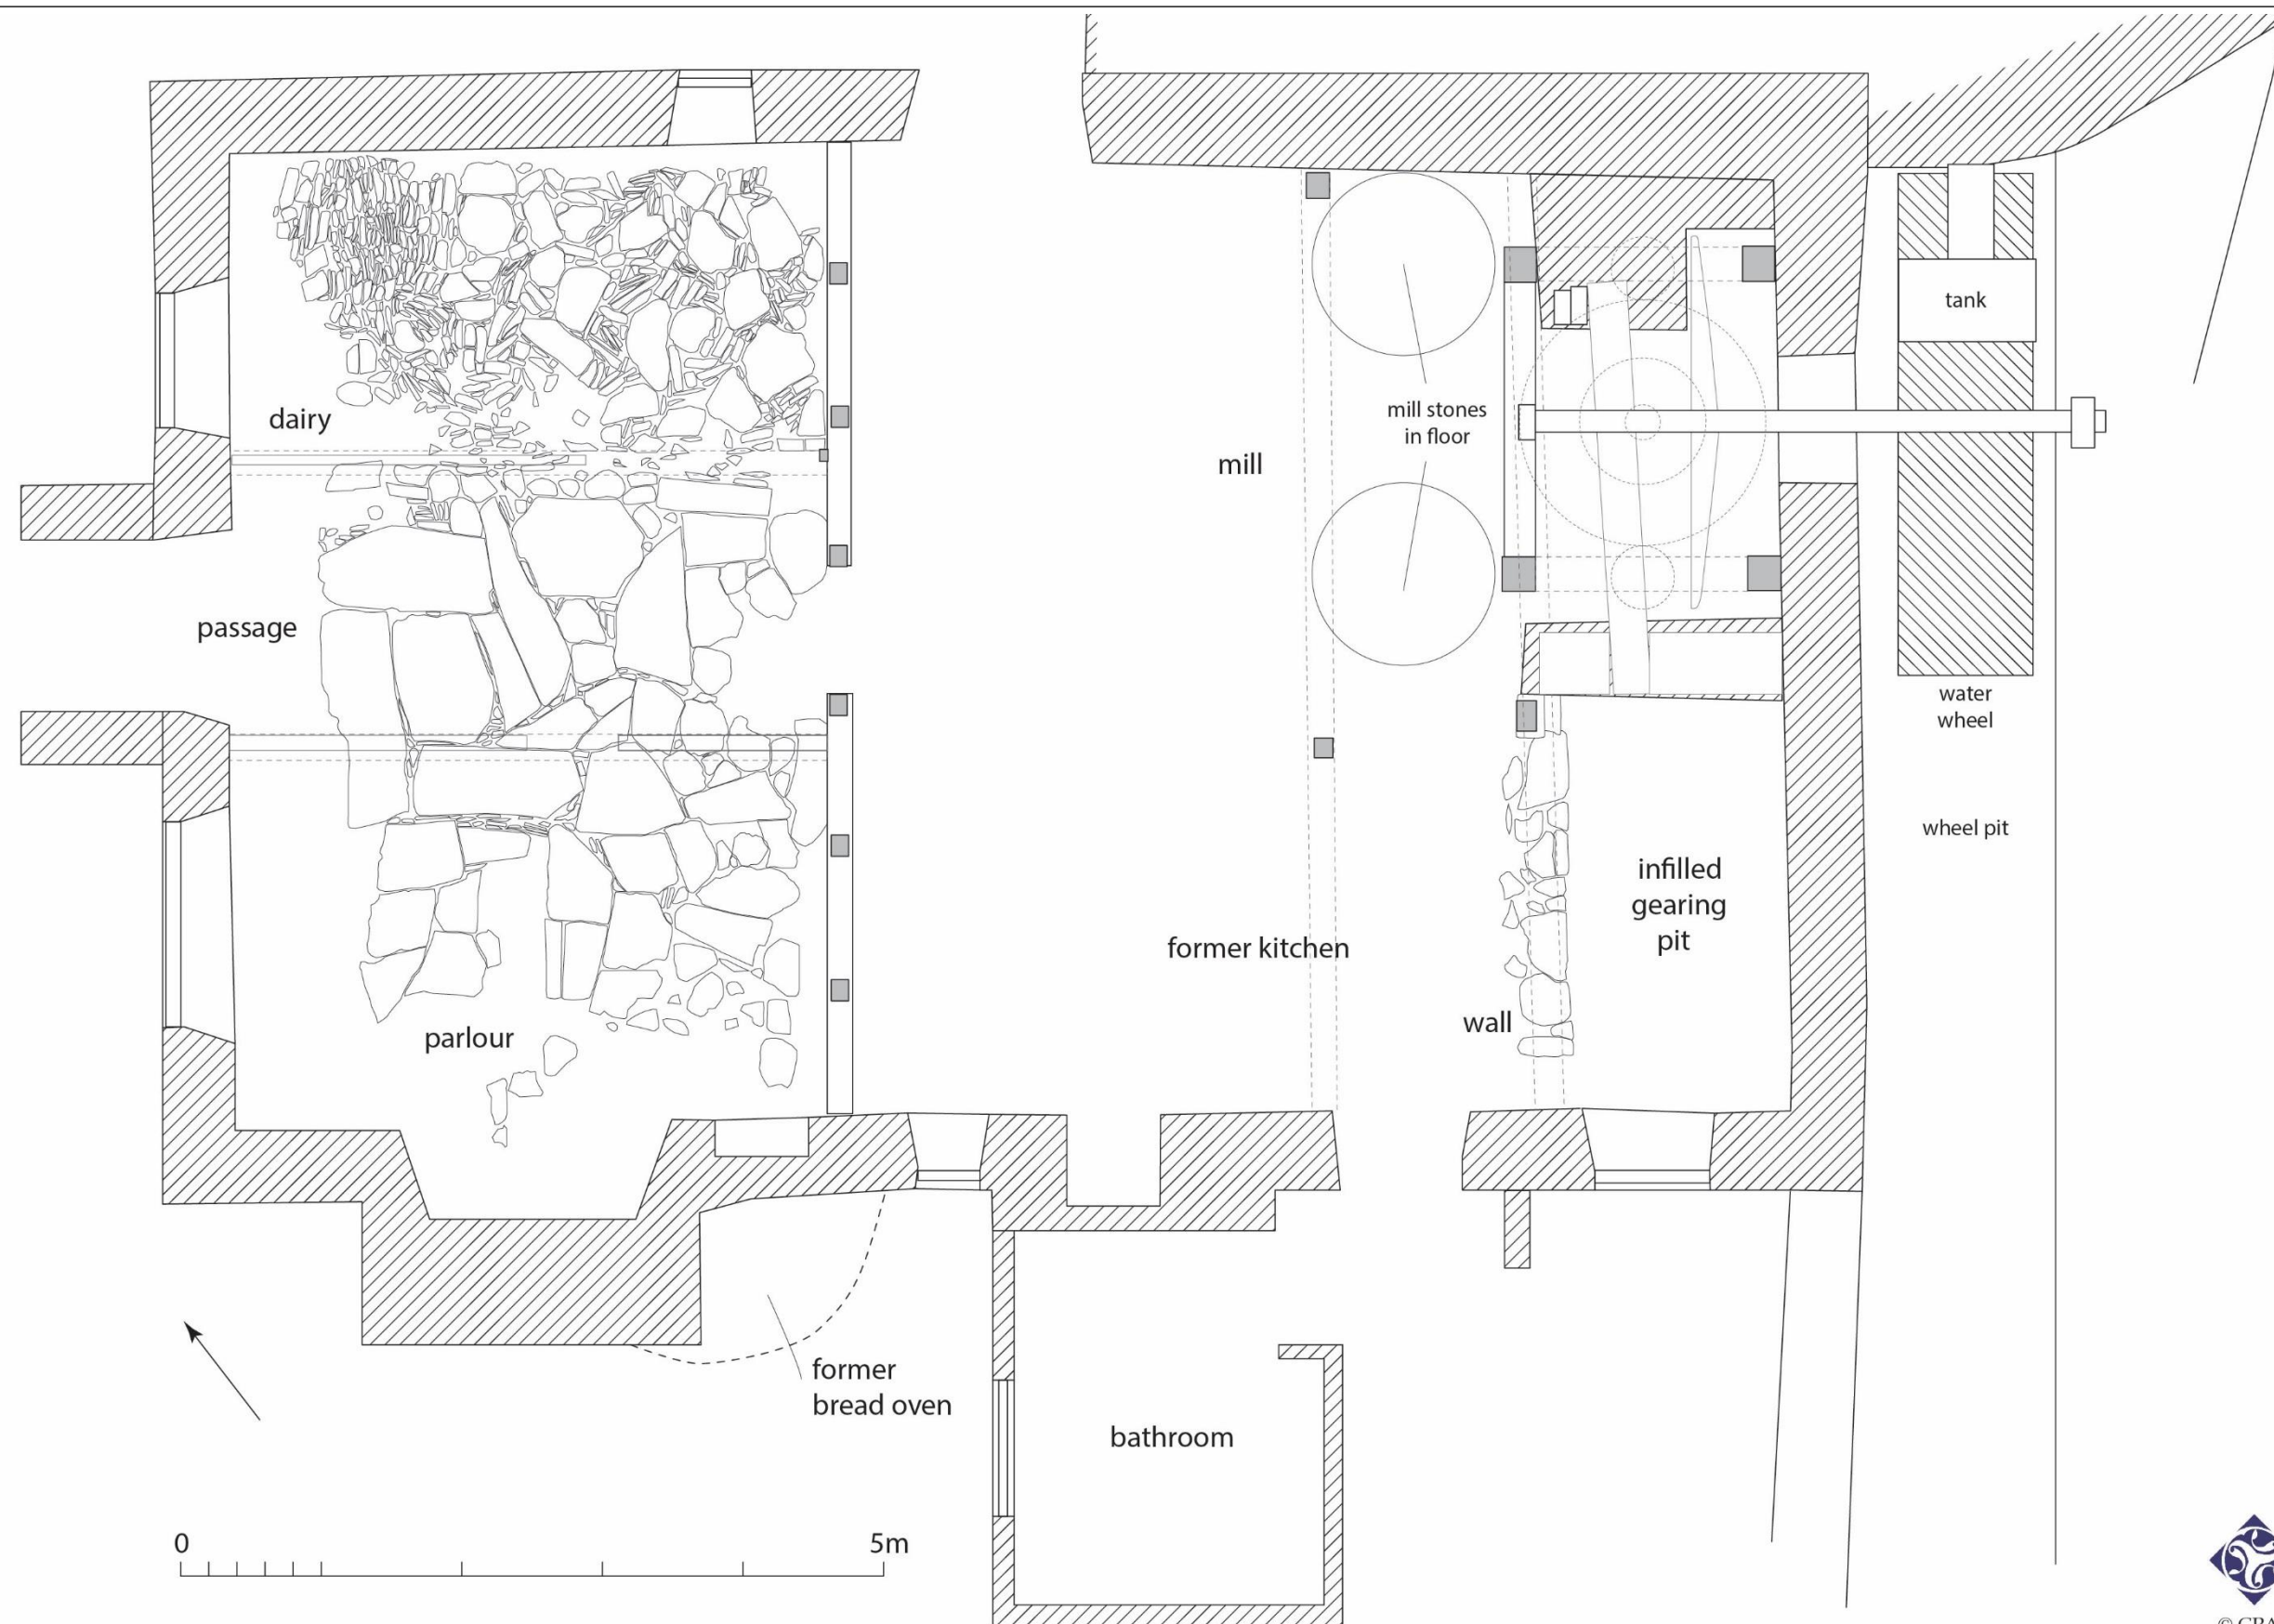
Ground floor plan of the mill building, showing the additional information revealed by the watching brief
